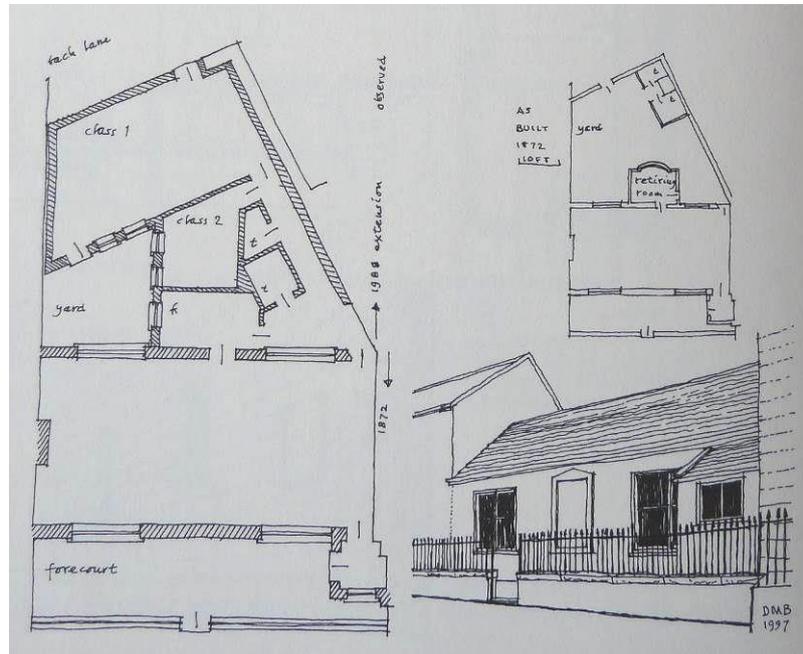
Plan as in 1997 (left) and as in 1872 (top right), and perspective. (Northeast is at the top of the plans, not to scale) (Butler, vol. 1, p. 234)
